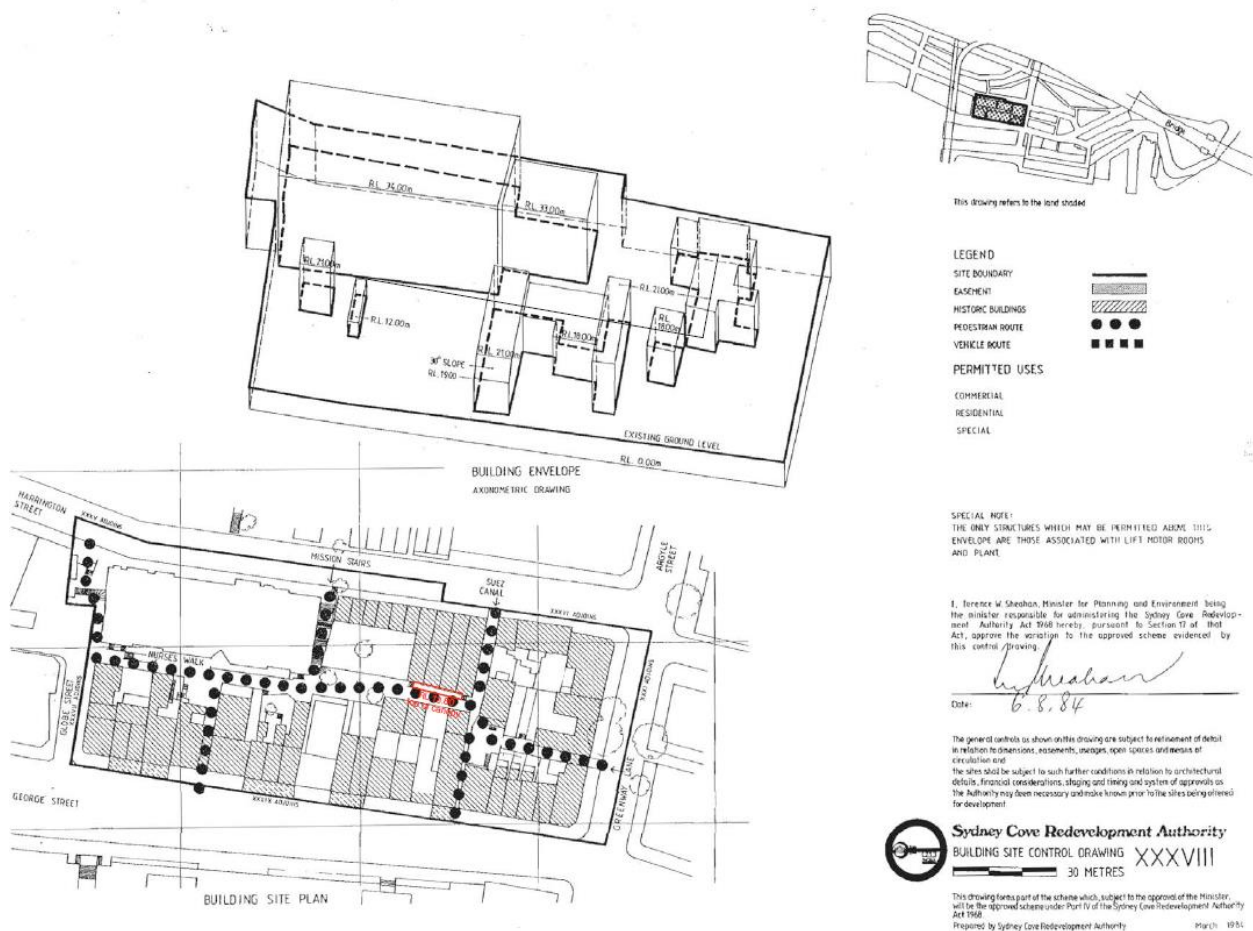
SCRA Scheme Building Site Control Drawing XXXVIII
